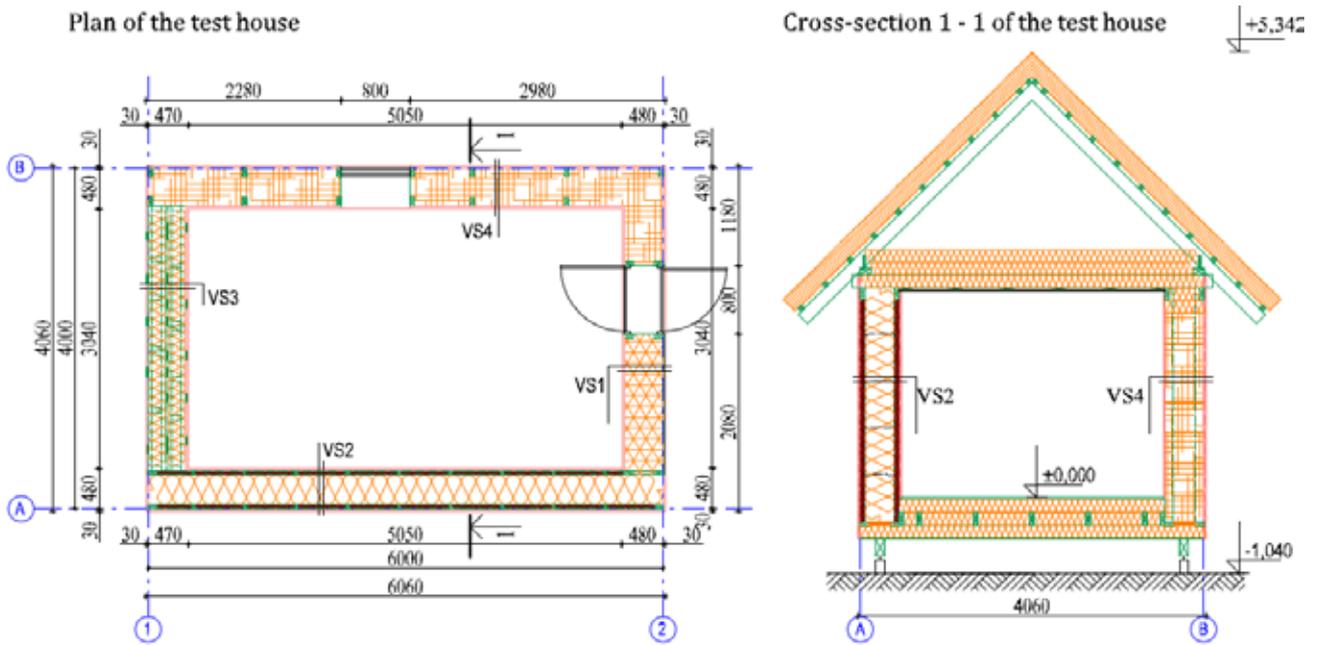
Plan and cross-section of test house with reed-insulated walls. See Figure 2 for structural details of the different wall types (VS1, VS2, VS3 and VS4).
